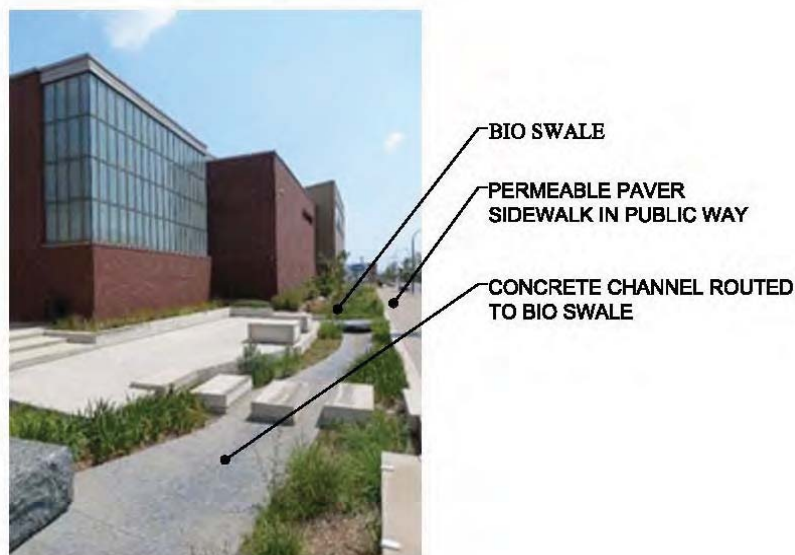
Facing East at Bio Swale and Building Addition near Cermak Rd.
